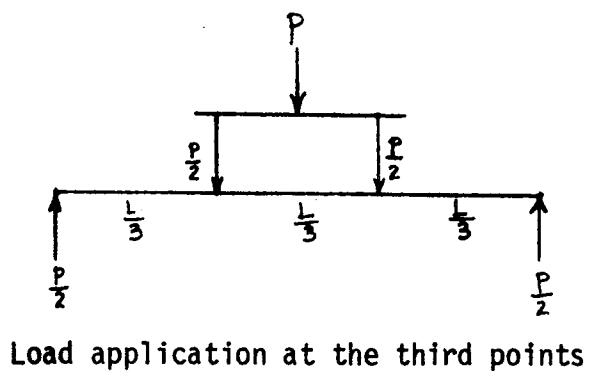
B. Thirdpoint Loading Diagram and Beam Cross-section.
